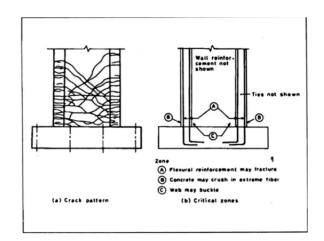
The critical zone and crack pattern of the shear wall (Source:The Indian concrete journal)
